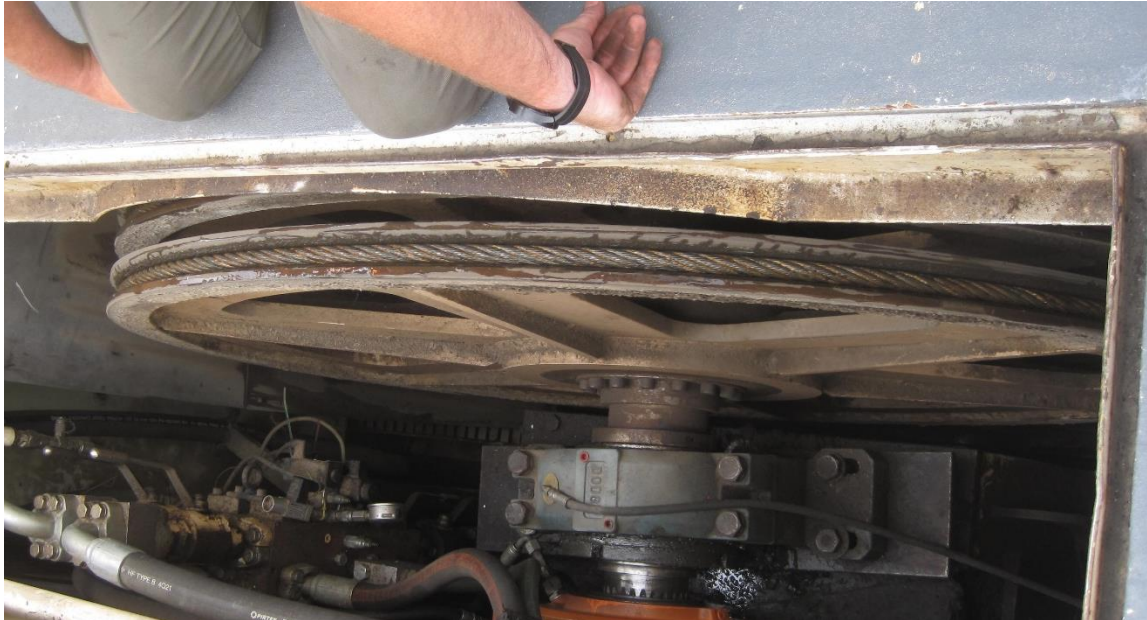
Drive Cable inspection at upper Drive Sheave on vessel
